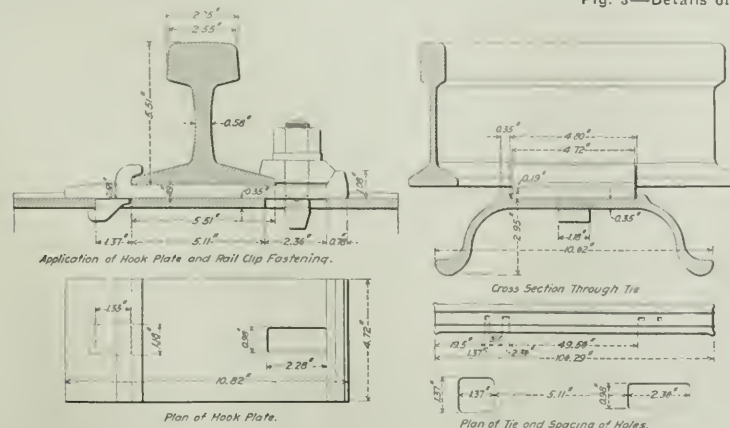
Haarmann Steel Tie and Hook Adapted to American Track.
